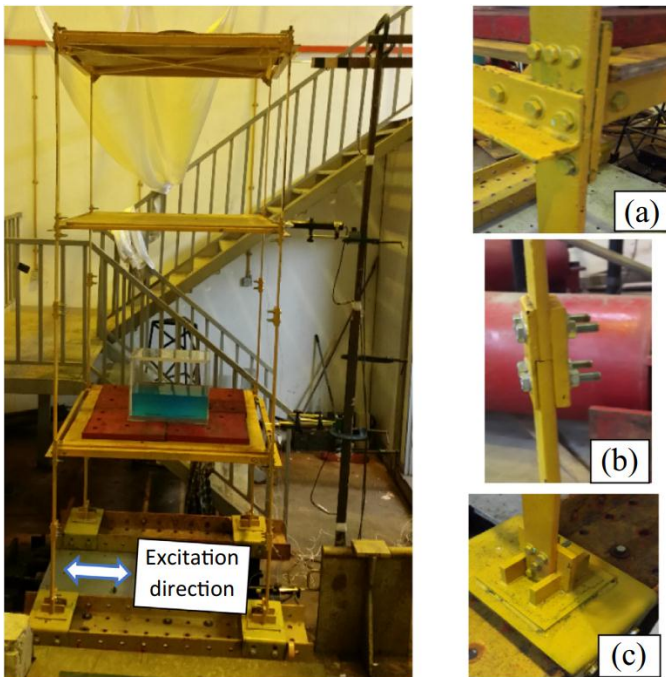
Test setup. (a) Beam-to- column connection (b) column splices (c) connection to the base.
